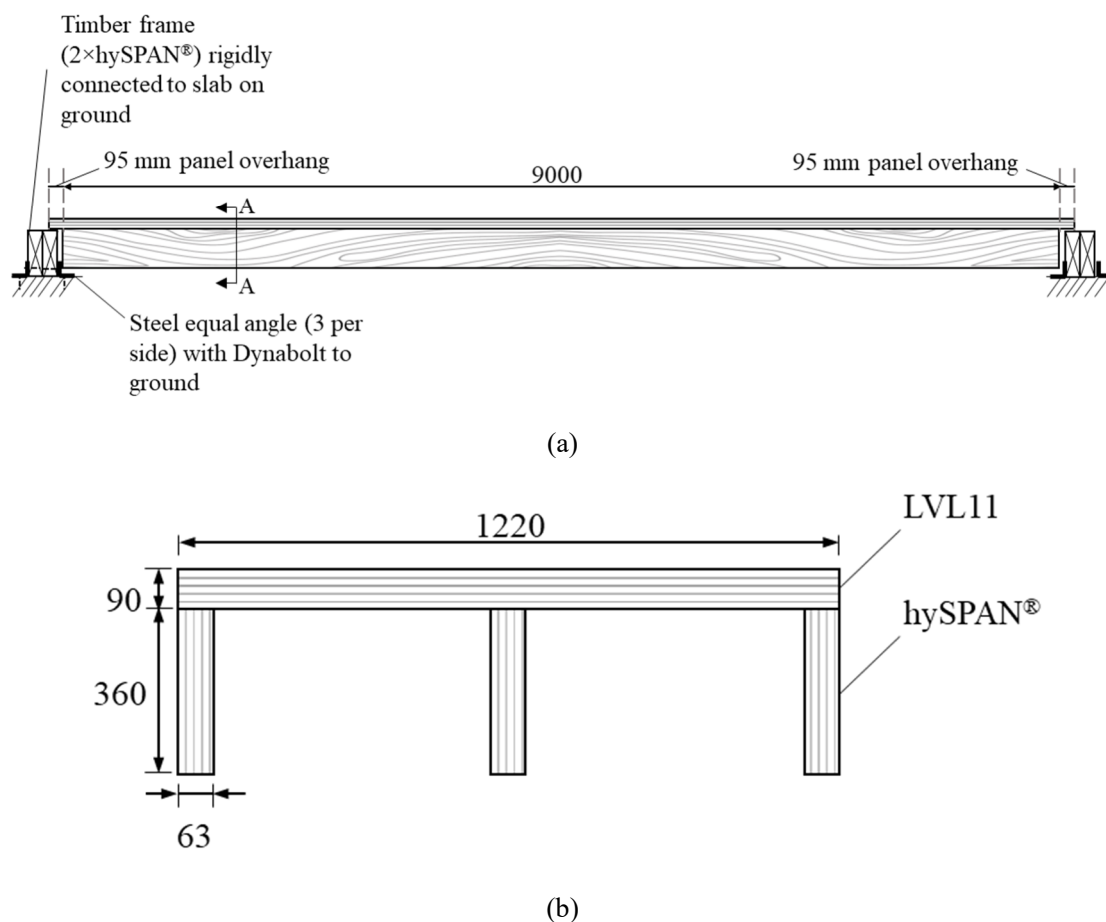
Tested ribbed-deck floor (a) elevation; (b) cross-section A
